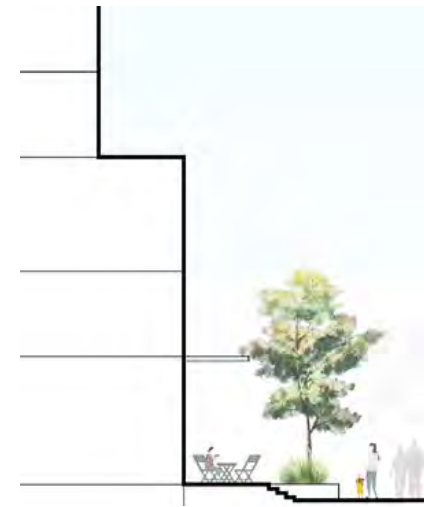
Building 2B frontage on Duke Mews (Section 2)
